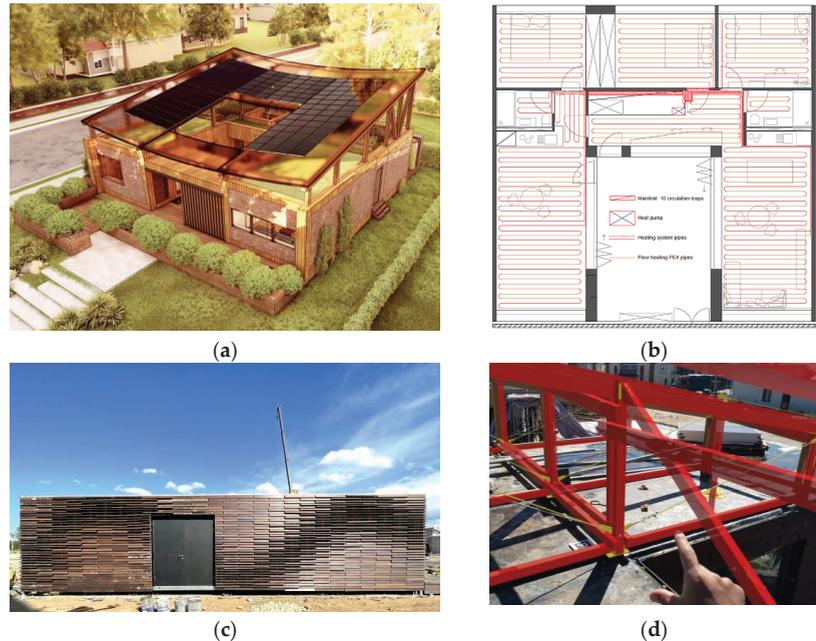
Main results of the Aurora. (a) Solar roof. (b) Underfloor heating/cooling. (c) Bamboo brick wall. (d) MR for construction.
